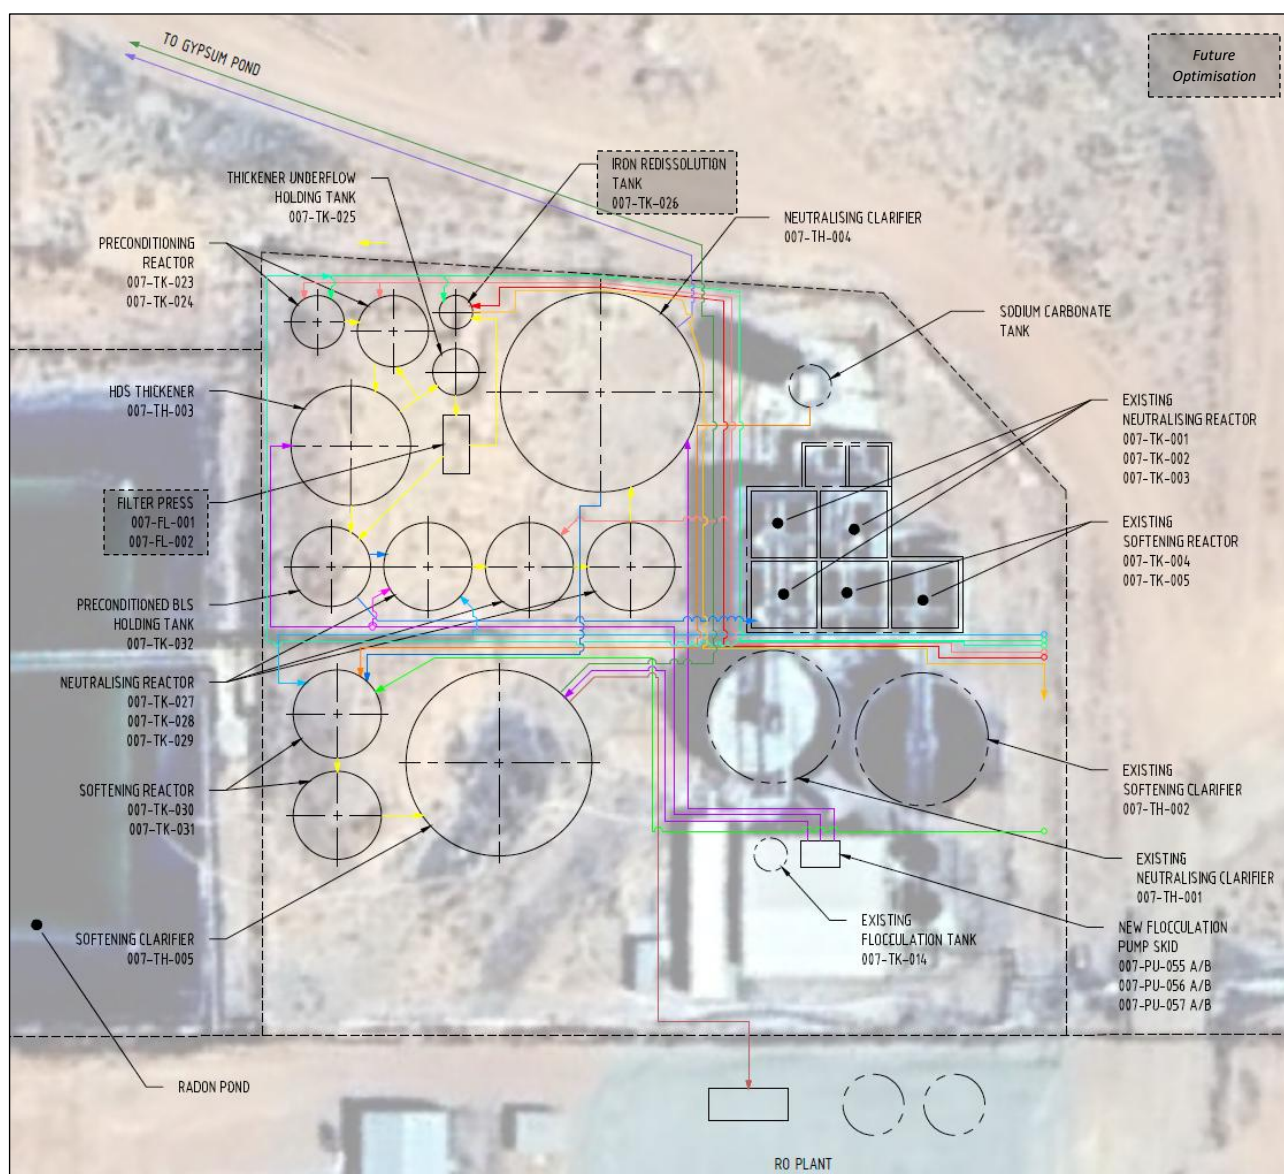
Proposed Upgraded Water Treatment Plant Layout
